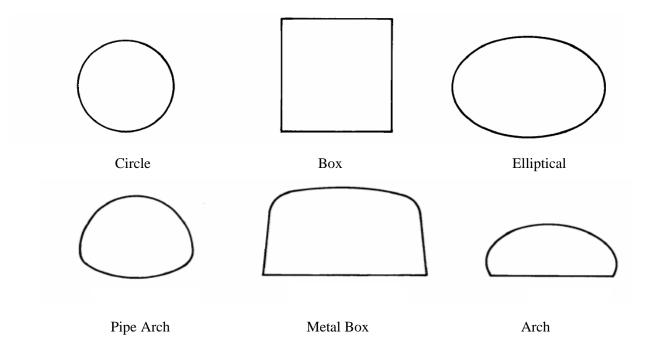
Commonly Used Culvert Shapes [Source: FHWA, 2005].
